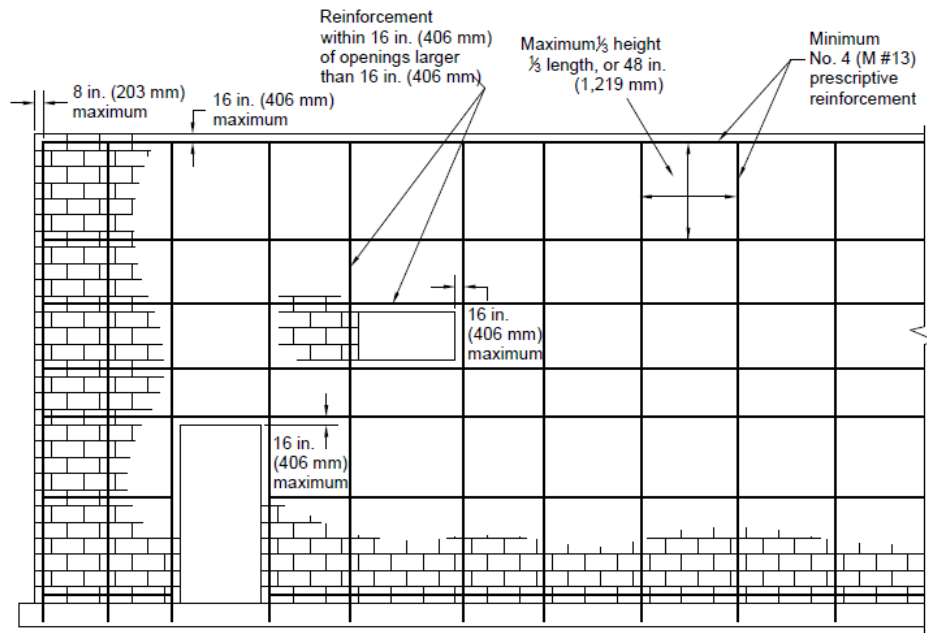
Prescriptive Seismic Detailing for Special Reinforced Masonry Shear Walls
